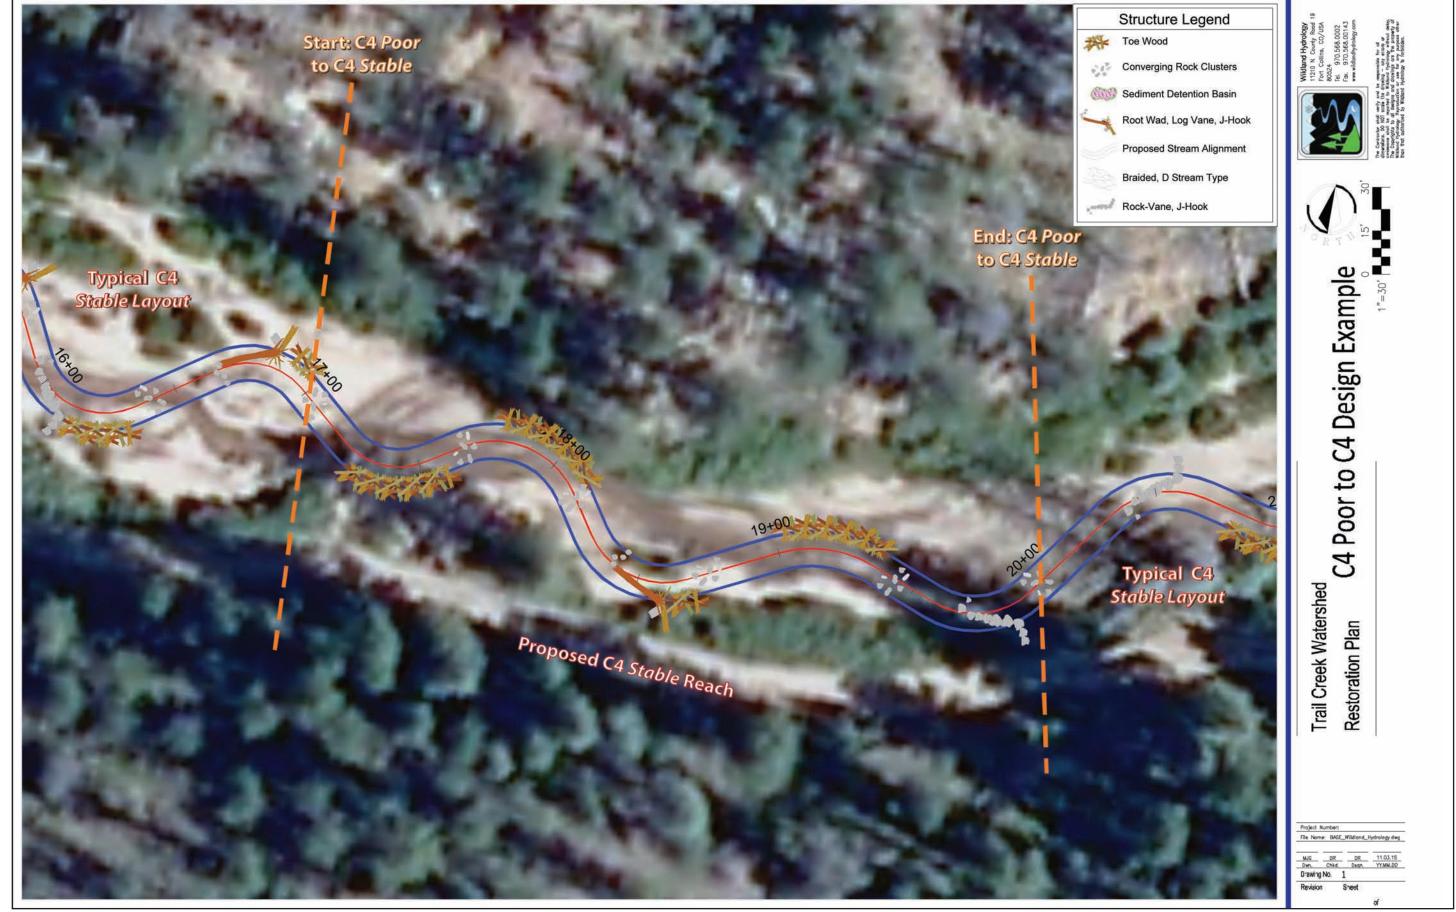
Plan view of the alignment for the proposed C4 Stable stream type, including stream stabilization and fish enhancement structures.
